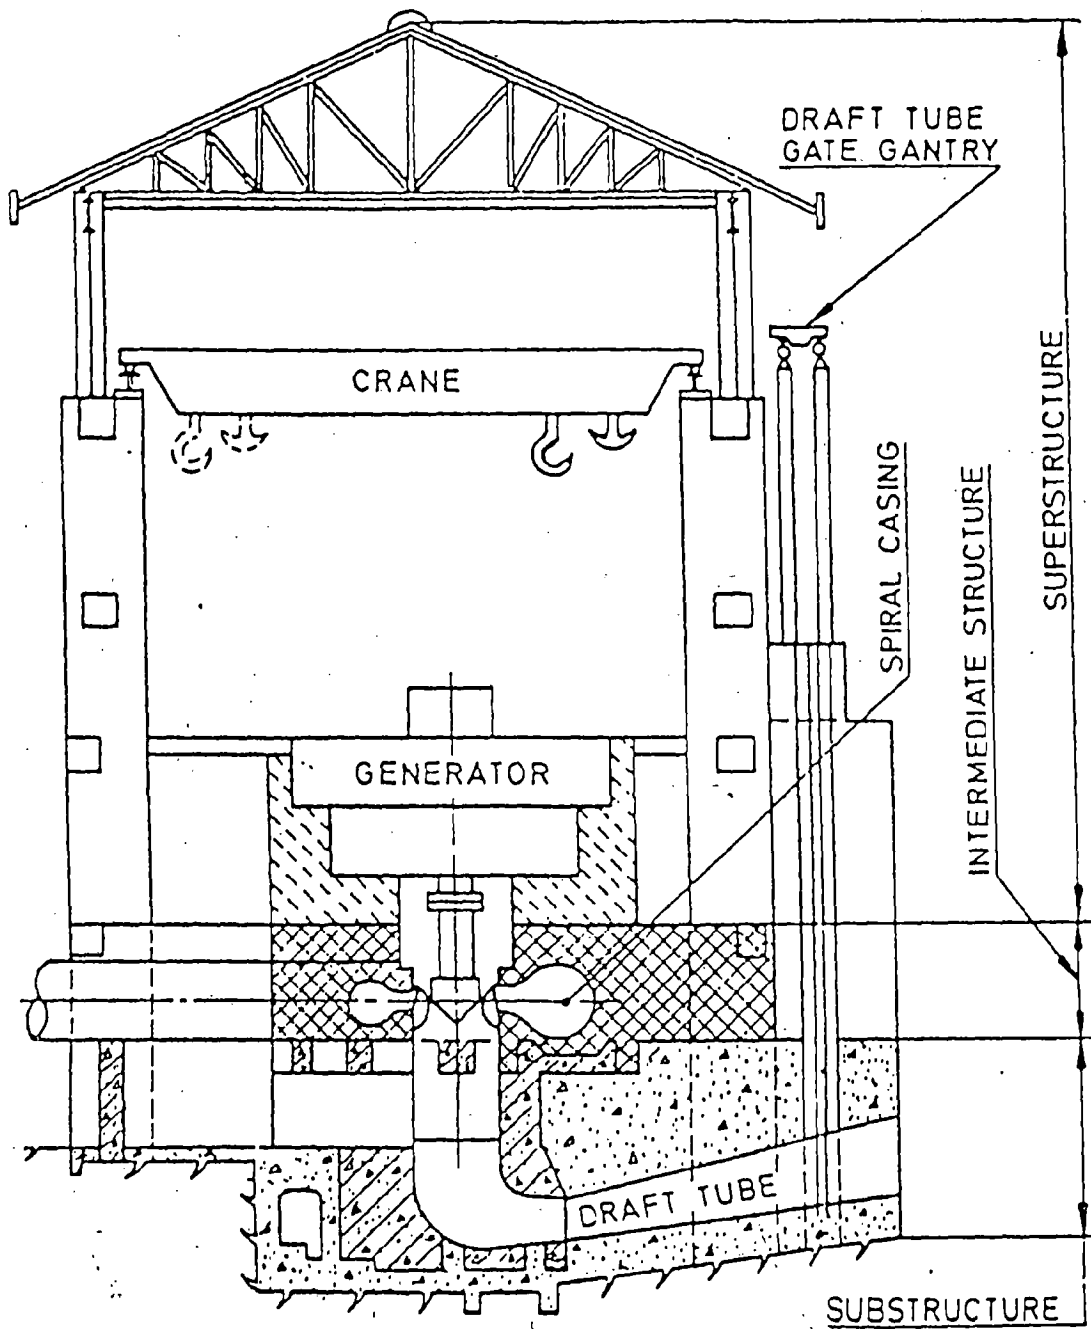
SHOWING THE SUB-DIVISIONS OF THE POWER HOUSE BUILDING
